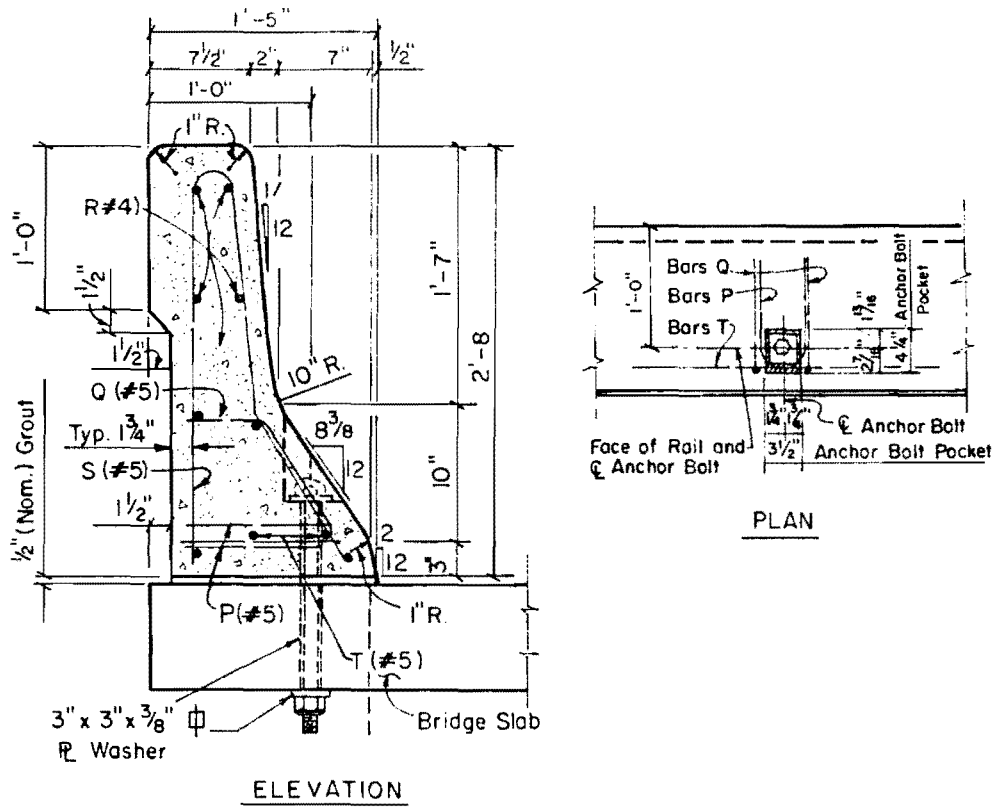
Texas SDHPT precast T5 traffic barrier
